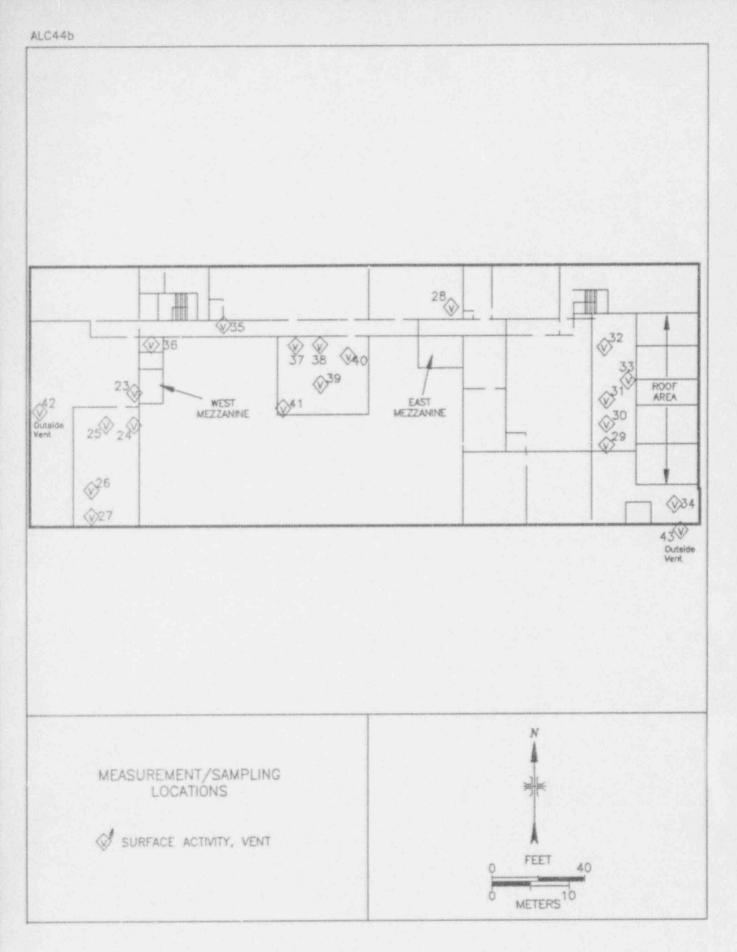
Building 65, Second Floor Ventilation System Measurement and Sampling Locations
